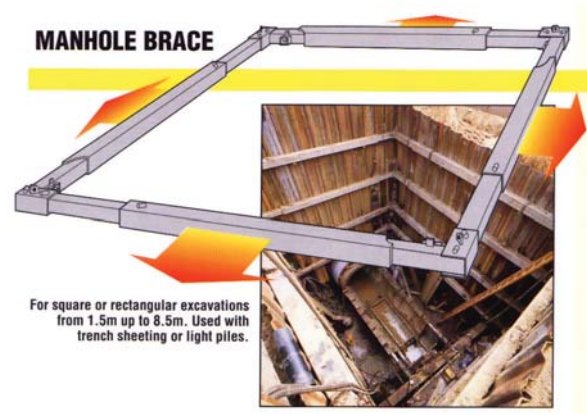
Hydraulic Bracing Frame - The Manhole brace
